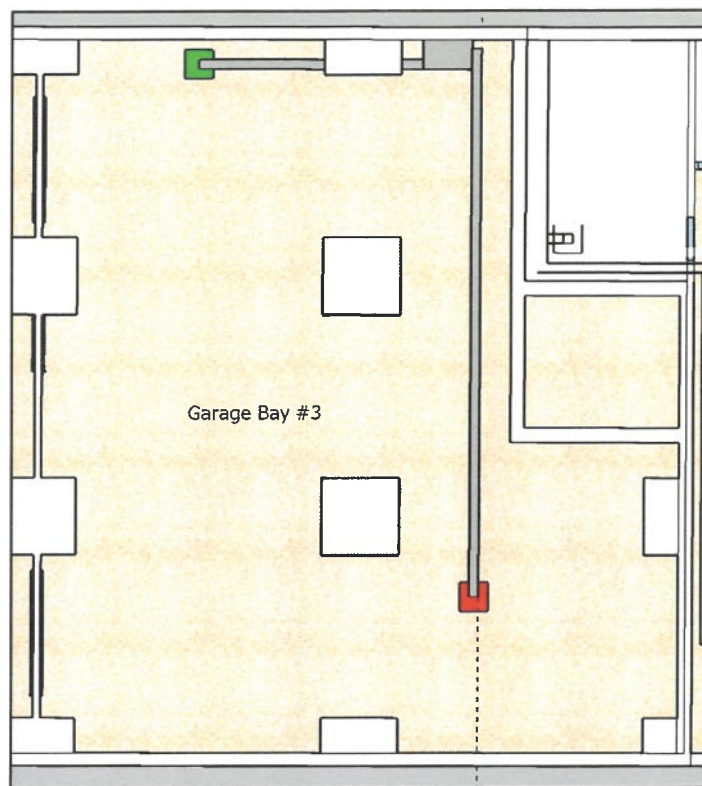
Isolated view of Garage Bay #3 showing recommended layout for HRV ducts.
